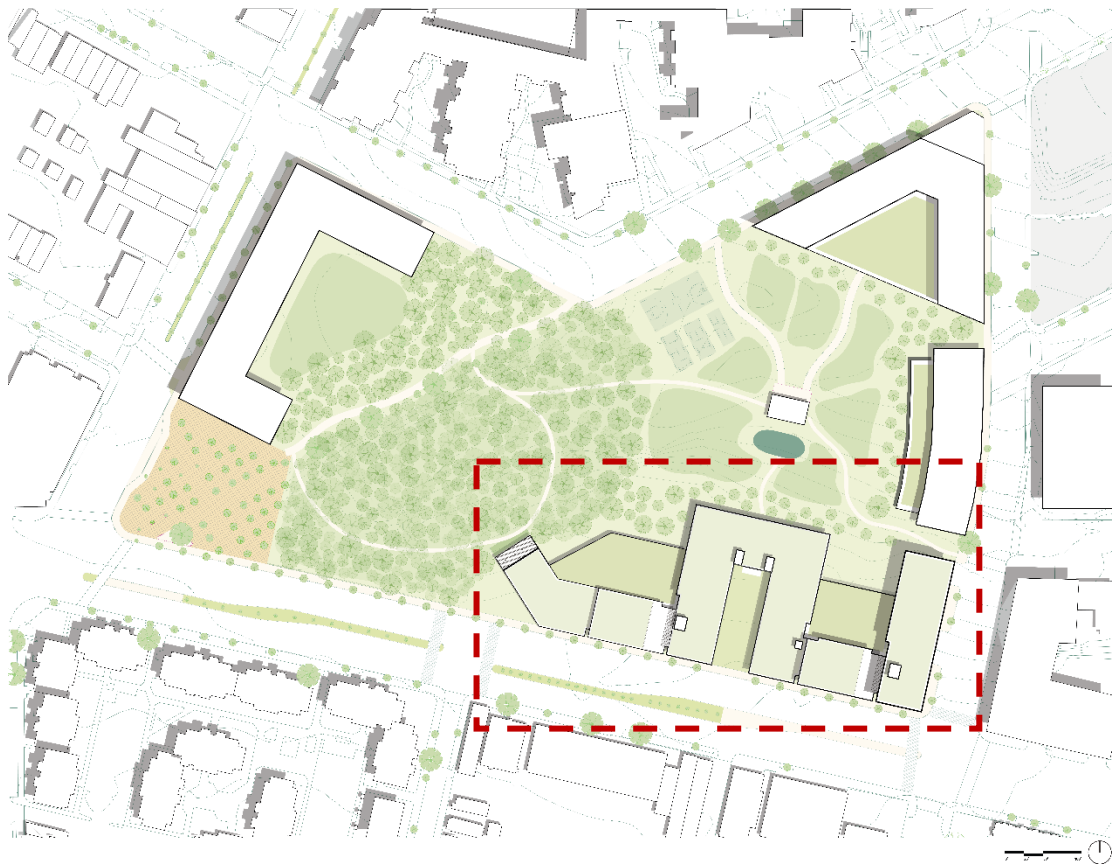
Proposed Site Plan with Building Focus (Source: Author)
